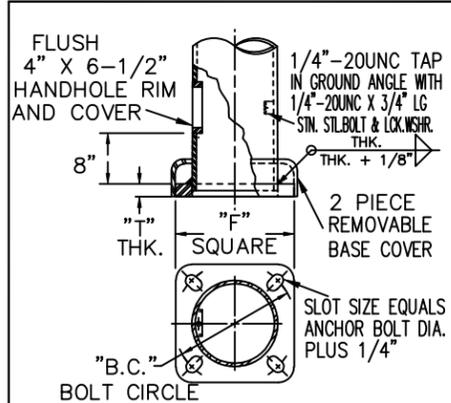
DETAIL G ORIENTATION FOR SINGLE ARM POLE
